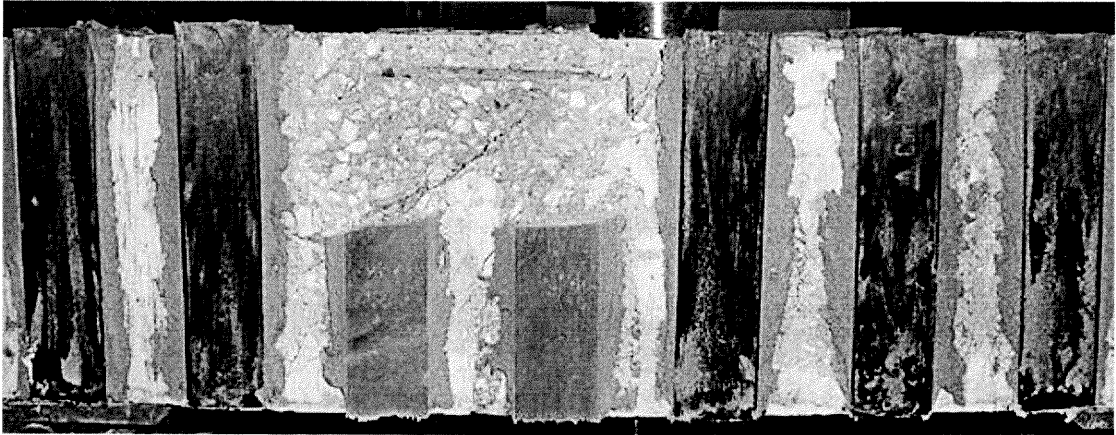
Failure of beam 1-3 with 90 degree aligned CFRP
